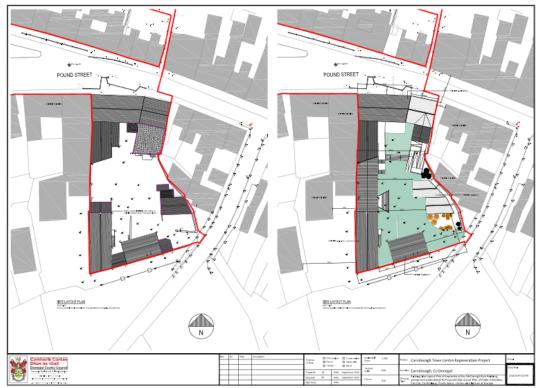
/C&P/CD/05:</u> Existing & Proposed Site Layout Plans Pedestrian Link, Urban Park and Creative Hub
